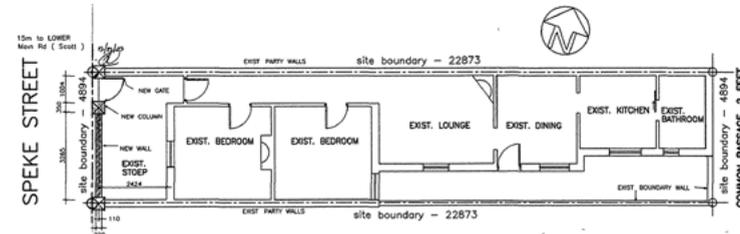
Narrow Row House, Observatory, Cape Town, South Africa ¹⁰
